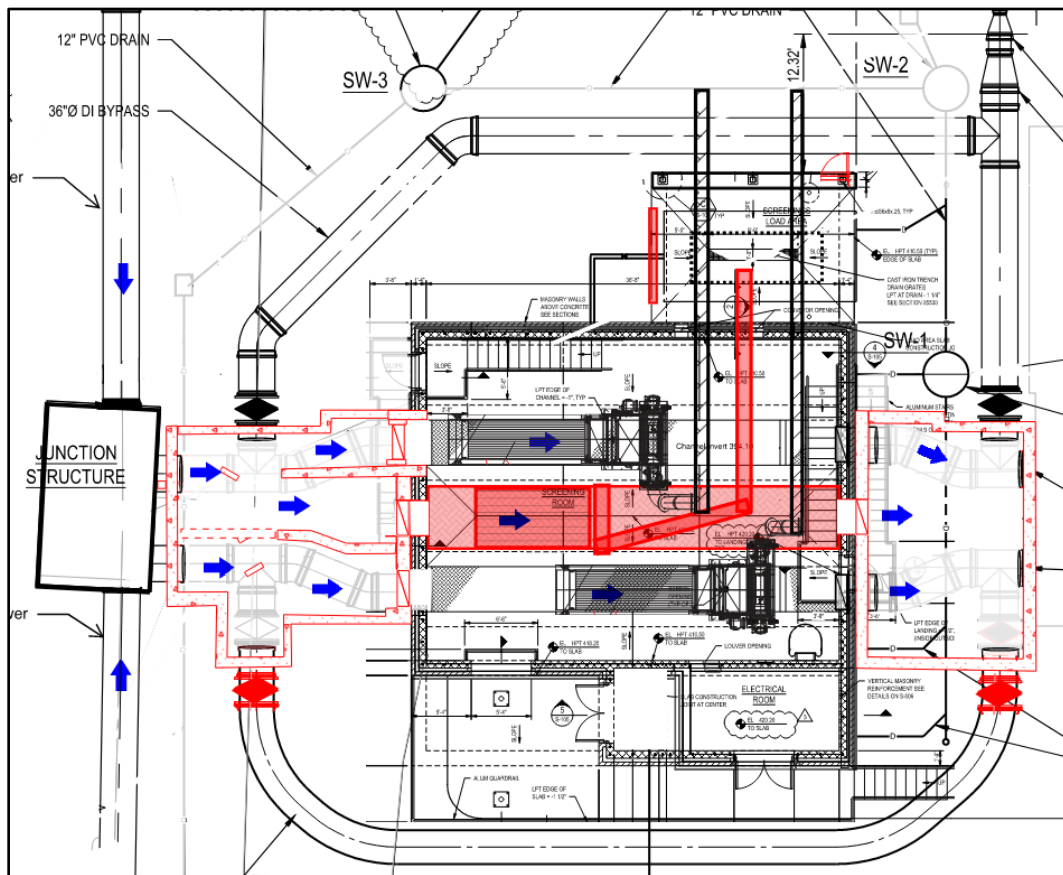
Alternative 4 - New Channel within Existing Screening Building
